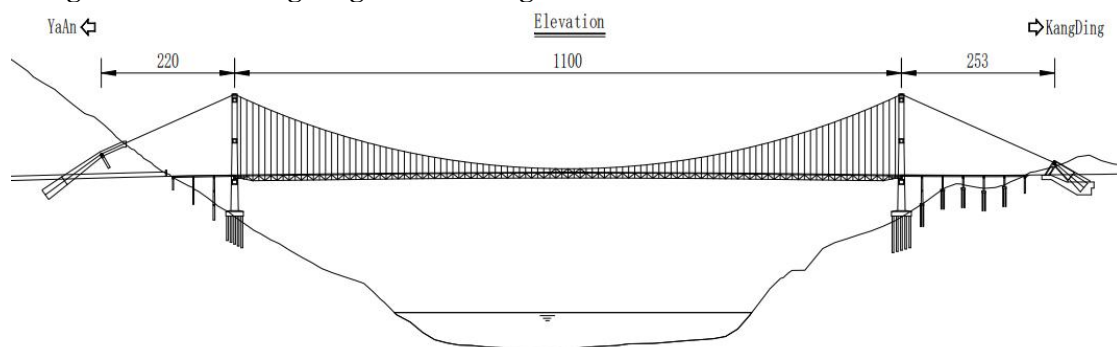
Layout of Luding Dadu River Xingkang Grand Bridge (Unit: m) The Luding Dadu River Xingkang Grand Bridge is a major bridge crossing the Dadu River on the Ya'an-Kangding Expressway in Sichuan (Figure 1). The main bridge is a 1,100-m single-span steel truss girder suspension bridge. The pylons adopt reinforced concrete portal frame structures, with a height of 188 m on both banks, and three corrugated steel web composite crossbeams are installed. The basic seismic intensity of the bridge is VIII degree. The design peak acceleration for E1 earthquake (10% exceedance probability in 100 years) is 345 gal, and for E2 earthquake (2% exceedance probability in 50 years) is 490 gal. The bridge was completed and opened to traffic in December 2018.
